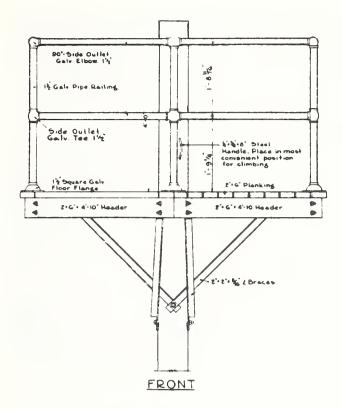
The "crows nest" detailed in plans for an "Observation mast for emergency lookout, 1937." These were to be only briefly occupied.
